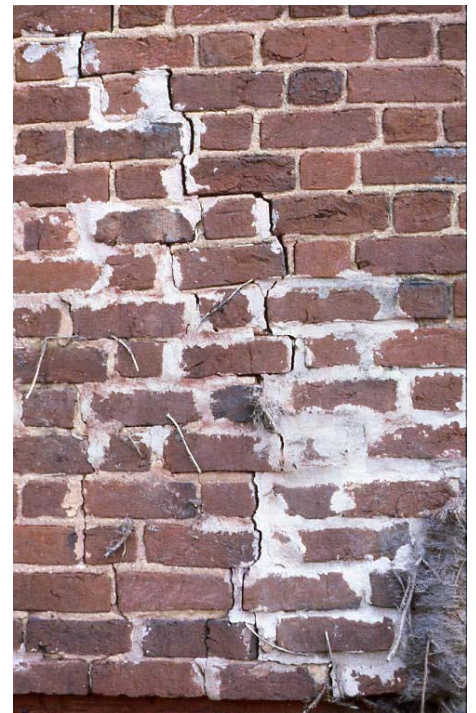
This wall is cracking due to shrink-swell soils. *(Photo by Tom Saxton)
